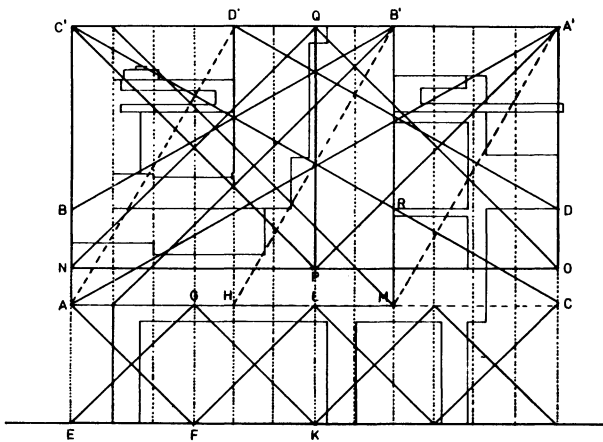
Schindler, Beach House, east elevation, proportional analysis (author).
